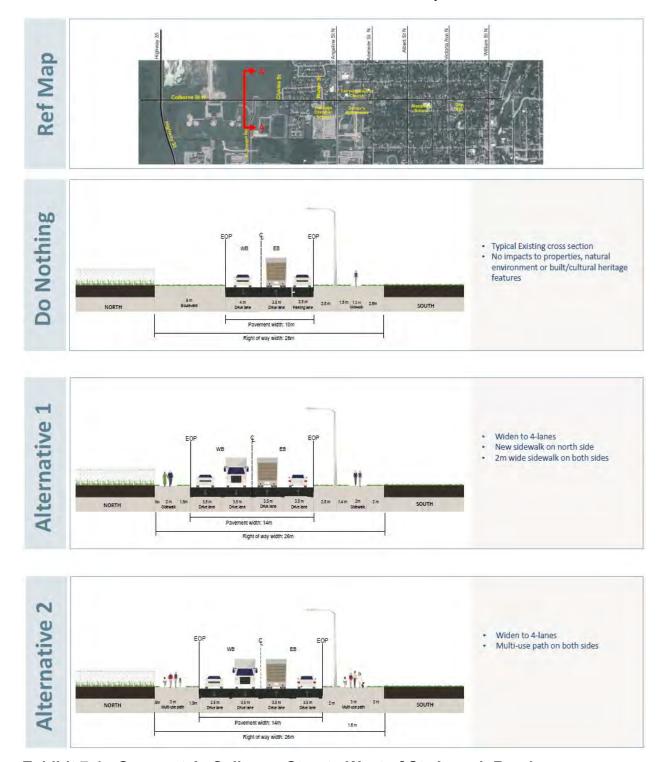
Segment A: Colborne Street - West of St. Joseph Road
